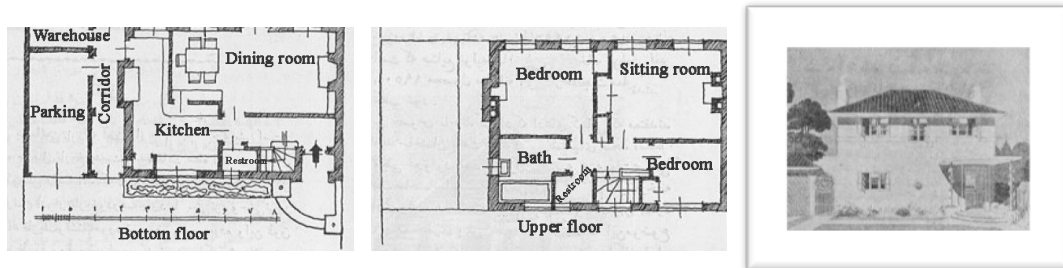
Exterior Façade and Plan of a House related to Pahlavi II in Tehran, 1949 (Architect 1926)
